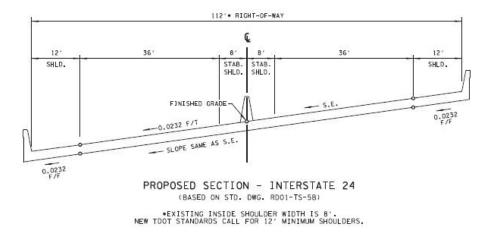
Typical Section of the I-24 bridge over Germantown Road
